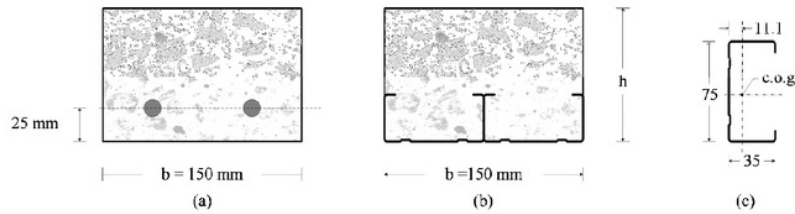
Cross section of the specimens: (a) reinforced concrete, (b) composite cold-formed steel and concrete, (c) dimension of the channel section
